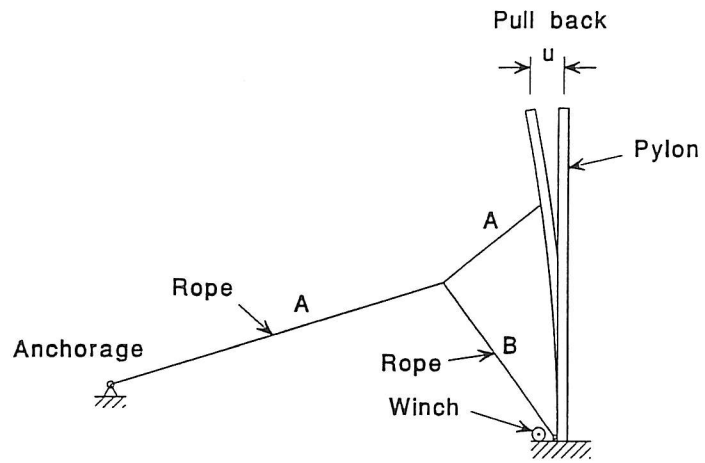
Prestetting pylons to prestress anchor portions of main cables
